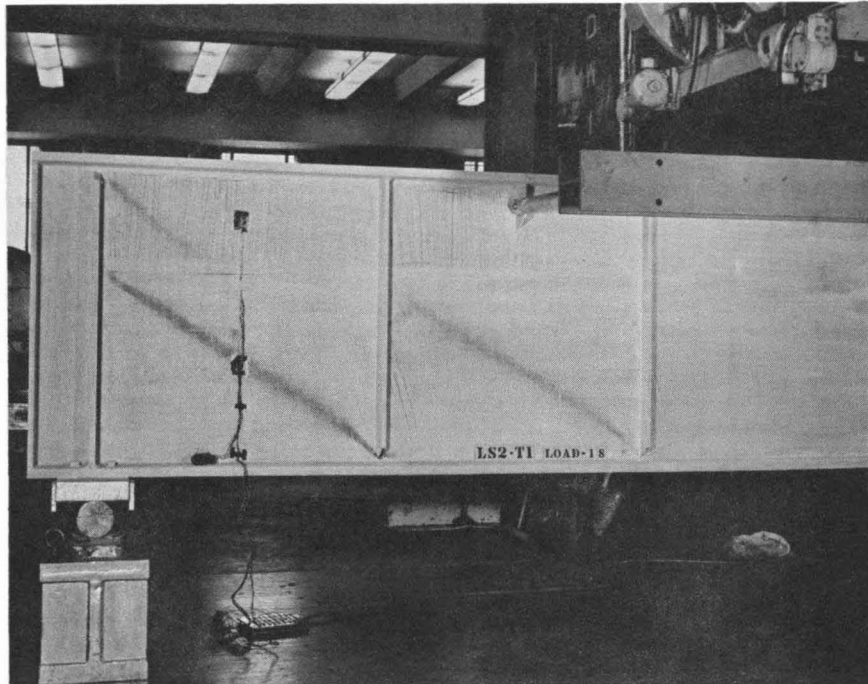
Girder LS2 at Load No. 18 (+ x end)
